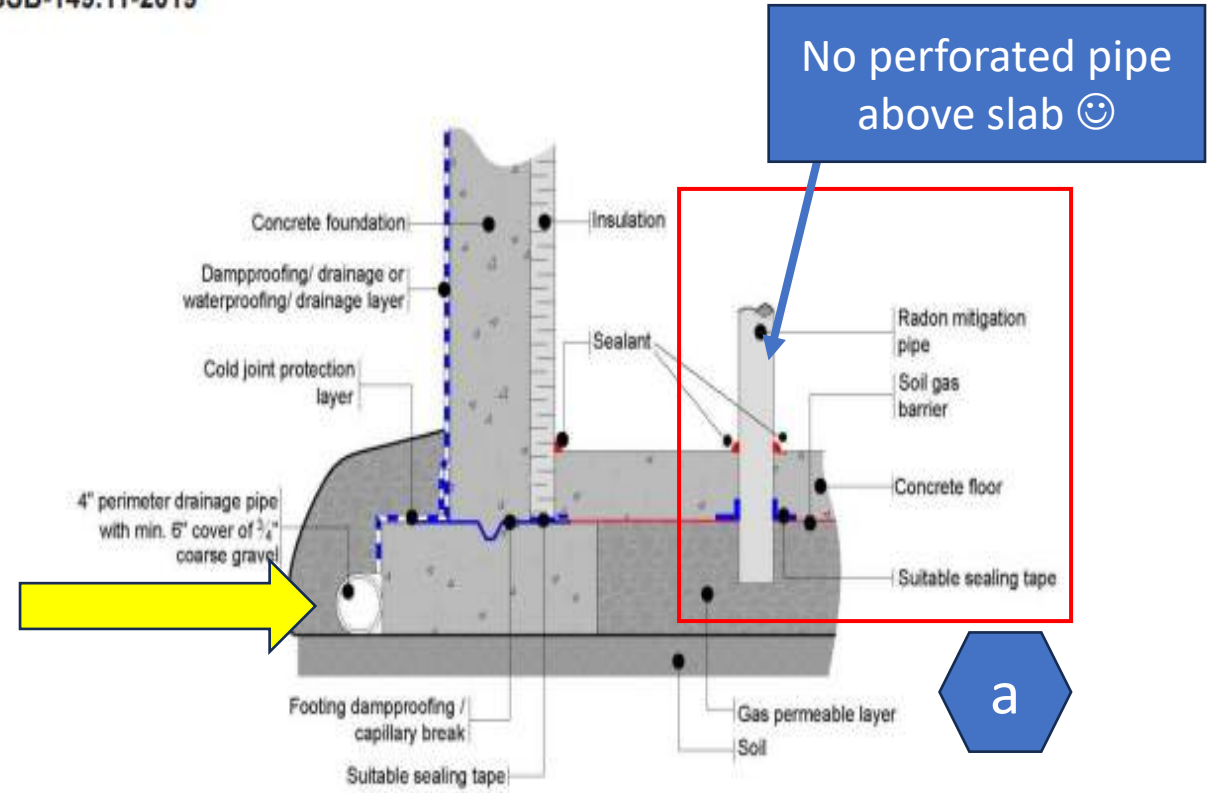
Sealing sub-slab membrane horizontally to concrete footing when insulation is between the foundation wall and floor slab
